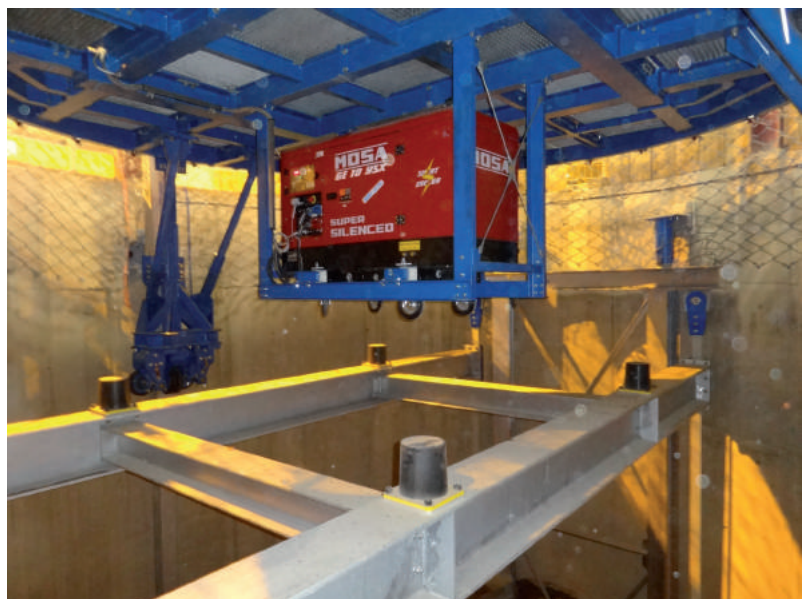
Shaft station steelwork with shaft access gate, call bell system, removable access panels and high-tensile wire mesh screen
